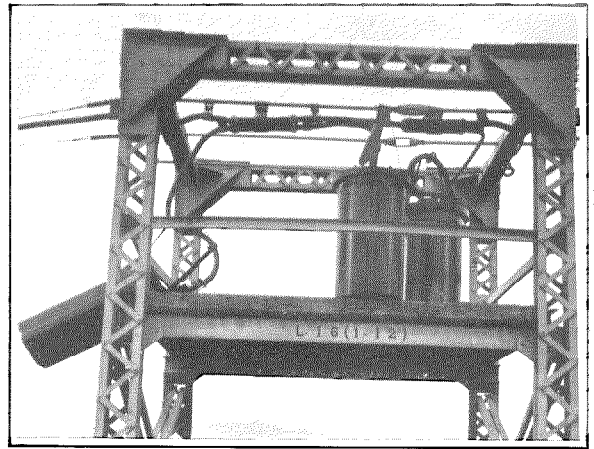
A Loading Coil Case Which Barely Escaped Dropping Down from the Tower.
